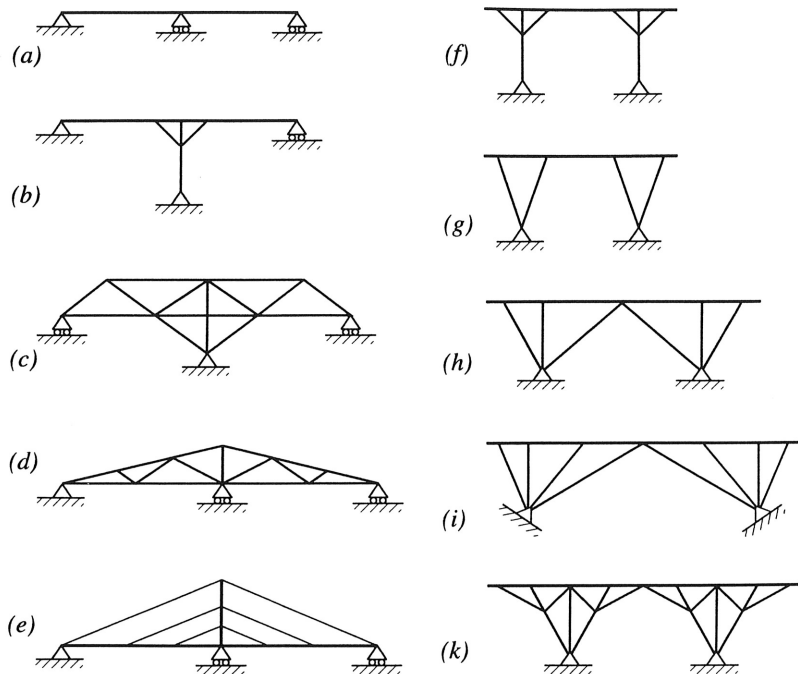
Structural forms. Continuous systems: (a) standard, (b) with knee-bracing, (c) framework, (d) truss, (e) cable-stayed; braced systems: (f) knee-bracing, (g) split-column, (h) propped beam, (i) strut frame, (k) knee-braced strut frame.
